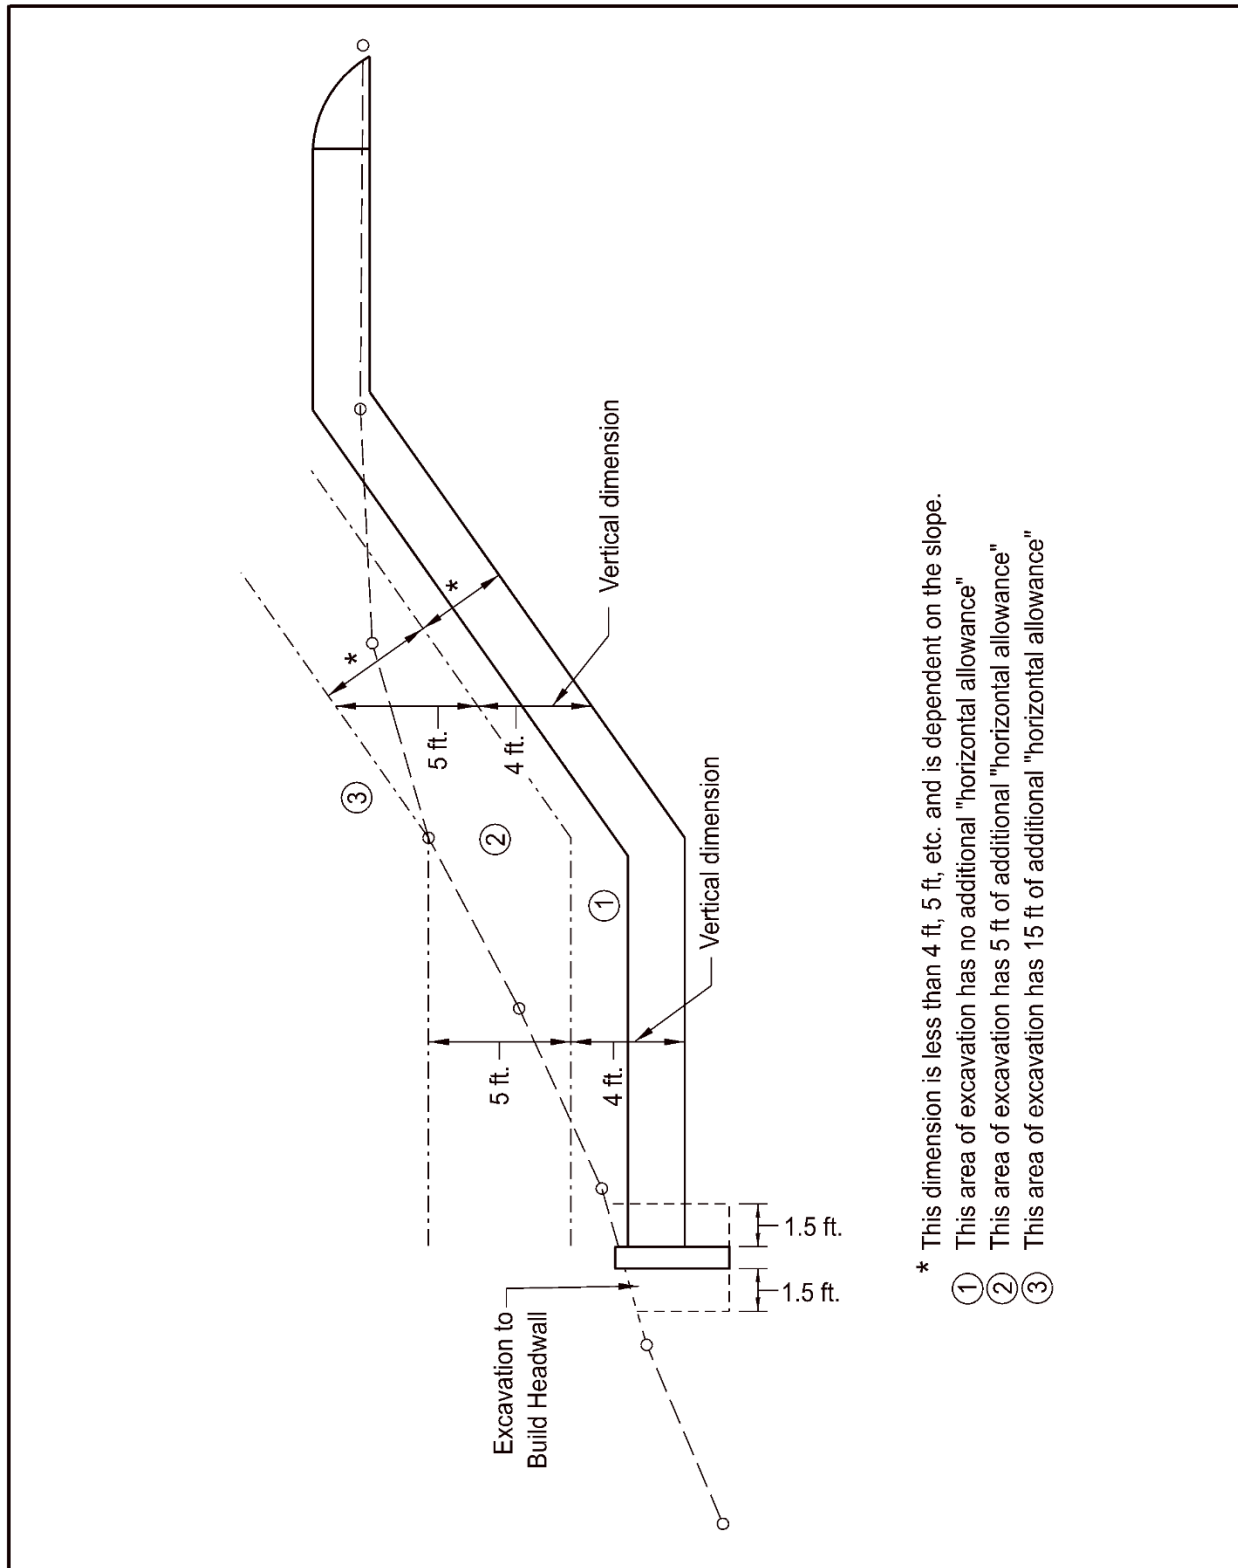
Separation of Excavation for Pipe Culverts and Headwalls, and Excavation for Box Culverts
